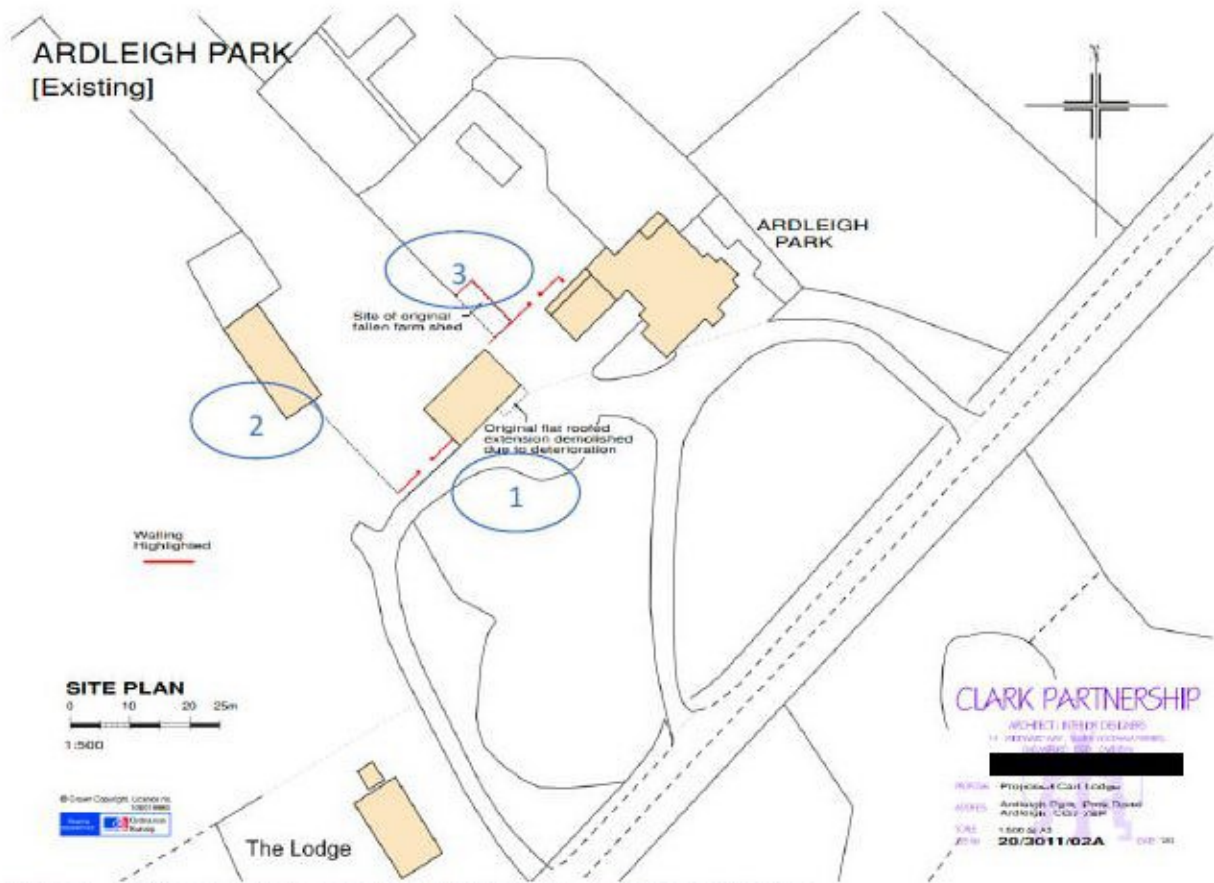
existing site plan. 1= garage block; 2=barn & 3 = wall & lost outbuilding.
